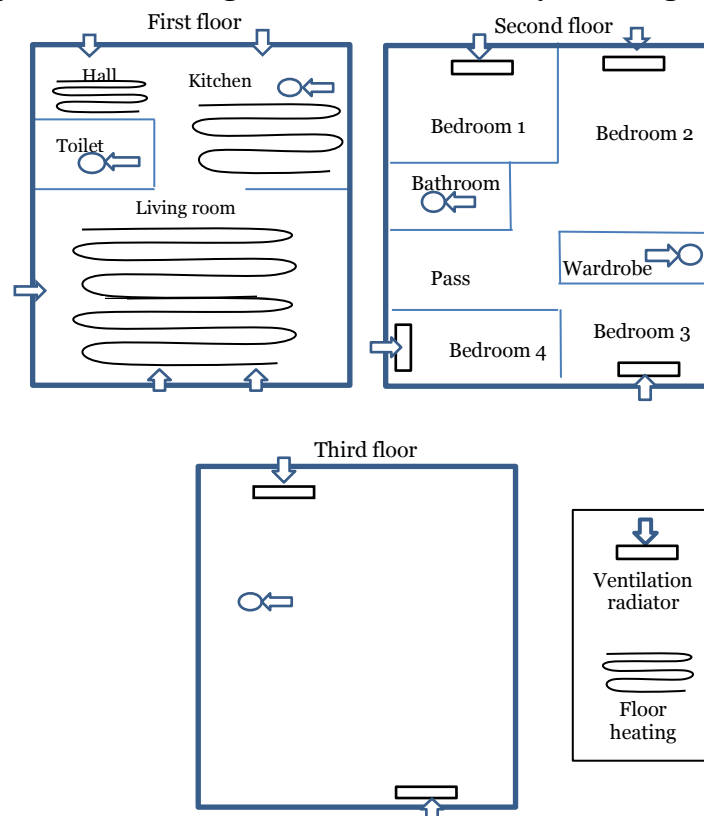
Two-family new-built building plan and schematic of airflow and heat emitters
